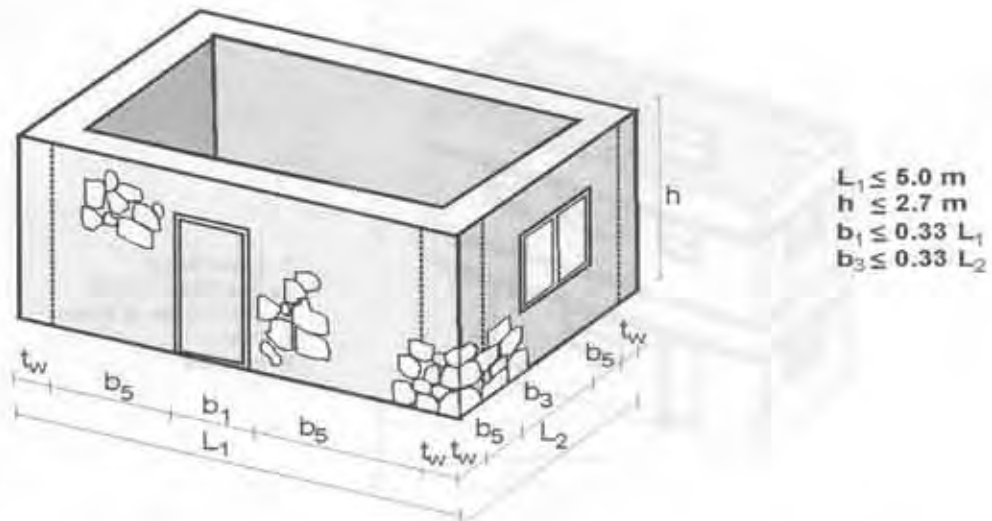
C Control on length, height and openings in stone walls built in mud mortar
